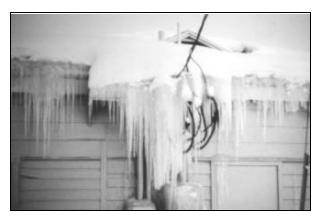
Electrical service entrance cables should not be located below cold eaves.
